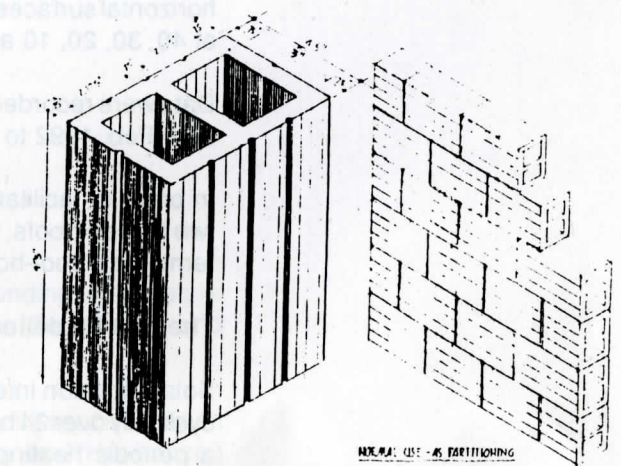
SLOPE OF HEAT TRANSMISSION THROUGH CONCRETE SLOPPING ROOF SLAB DESIGNED WITH A TERTIARY OR LOCAL MANUFACTURED HOLLOW POSITIONED BRICKS
